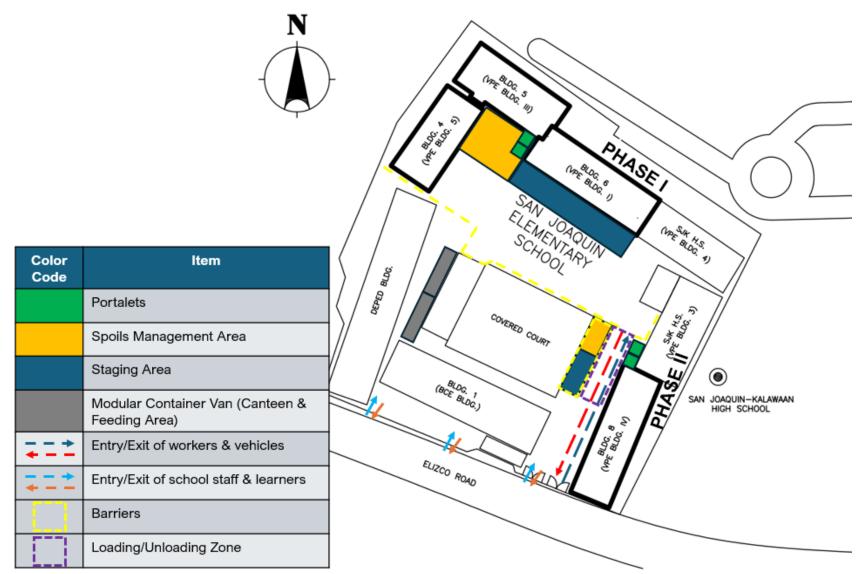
Proposed Staging Area and other Support Facilities in San Joaquin Elementary School
